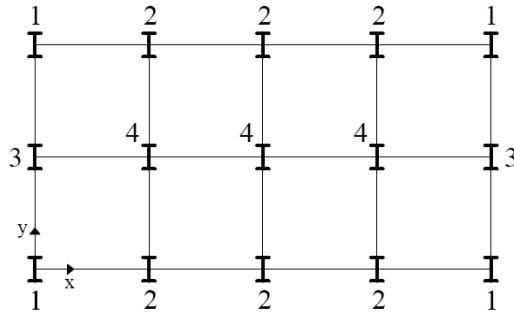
Columns grouping of 135-member steel frame in plan level
